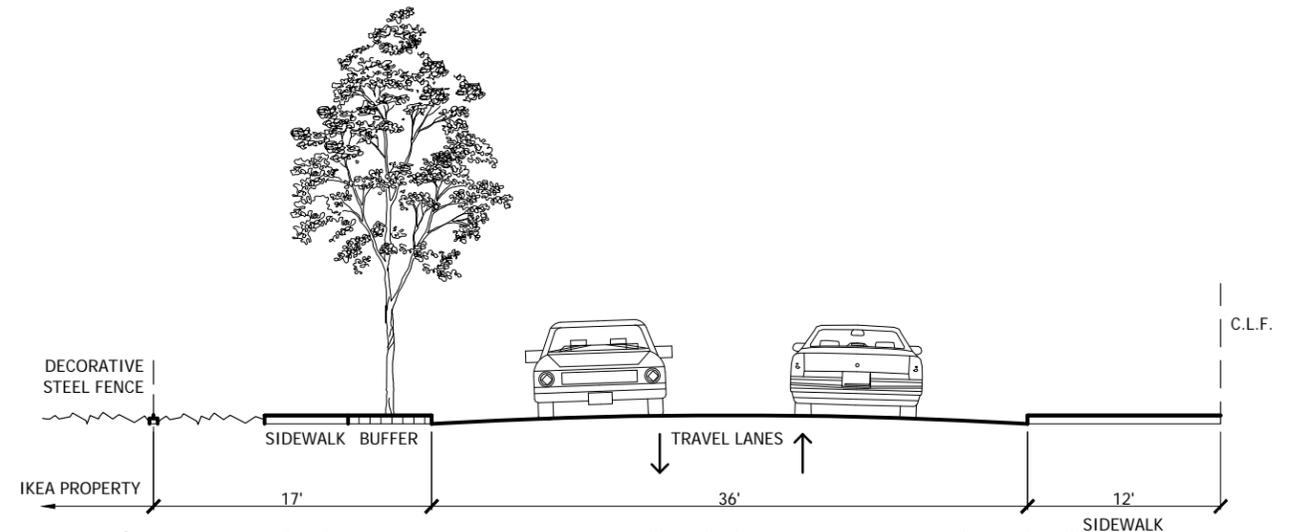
Existing configuration on Columbia Street opposite Erie Basin Park and adjacent to Gowanus Industrial Park
